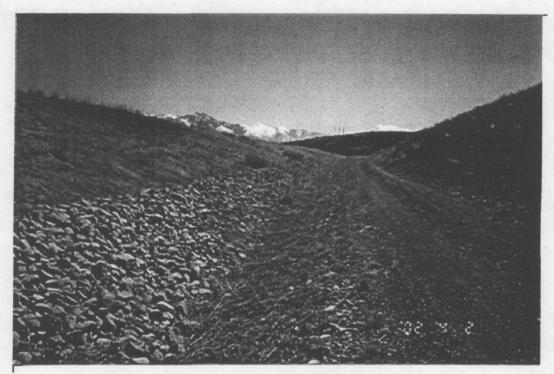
, SD No. 2W, Southwest Ditch (looking southeast)
